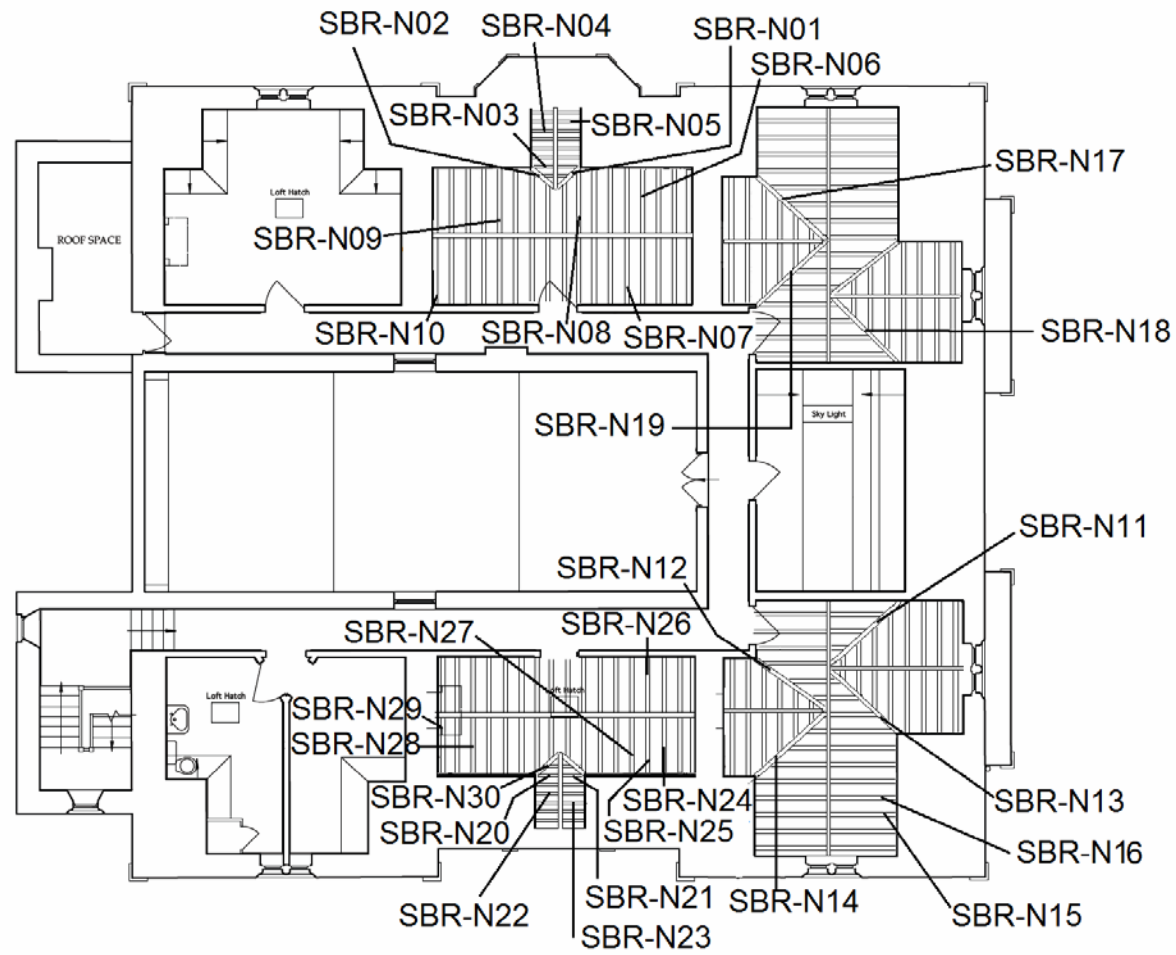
Second-floor plan, showing the location of samples SBR-N01–30 (Blackett-Ord Conservation)
